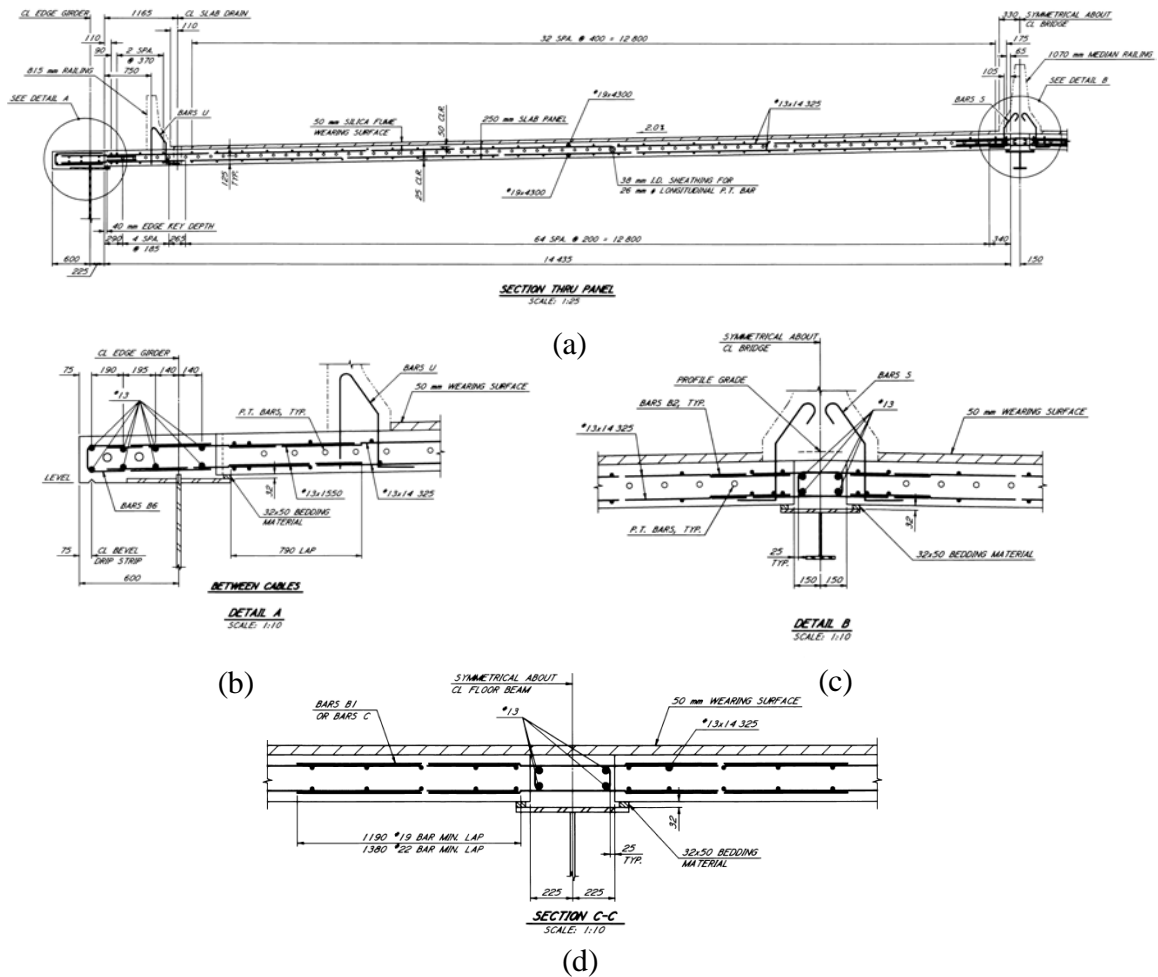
FDPC deck panel details for U.S. Highway 82 across the Mississippi River: (a) FDPC deck panel, (b) deck end connection detail, (c) longitudinal joint, and (d) transverse joint detail
